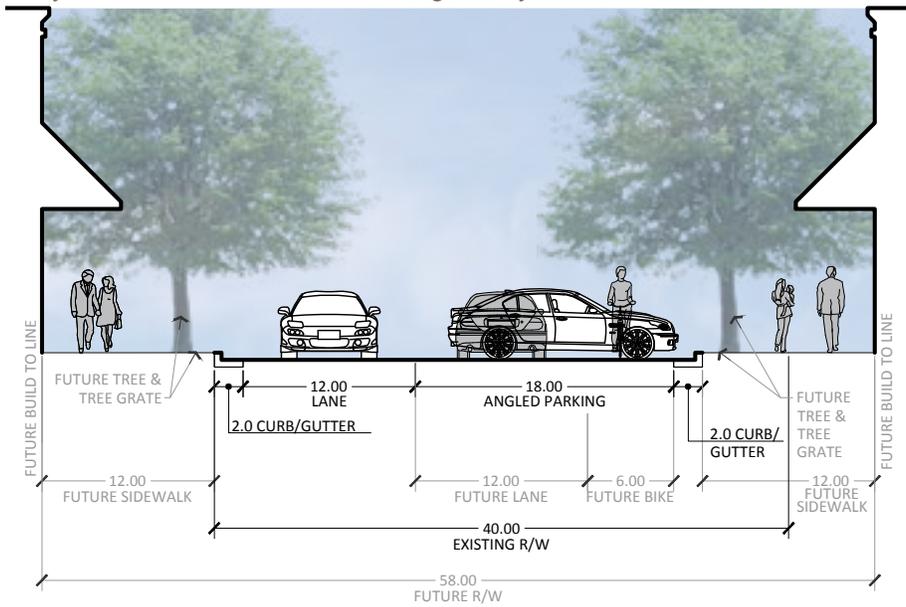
B: Right-of-Way with Existing Structures Setback (e.g., Park Street, Penn Street)
